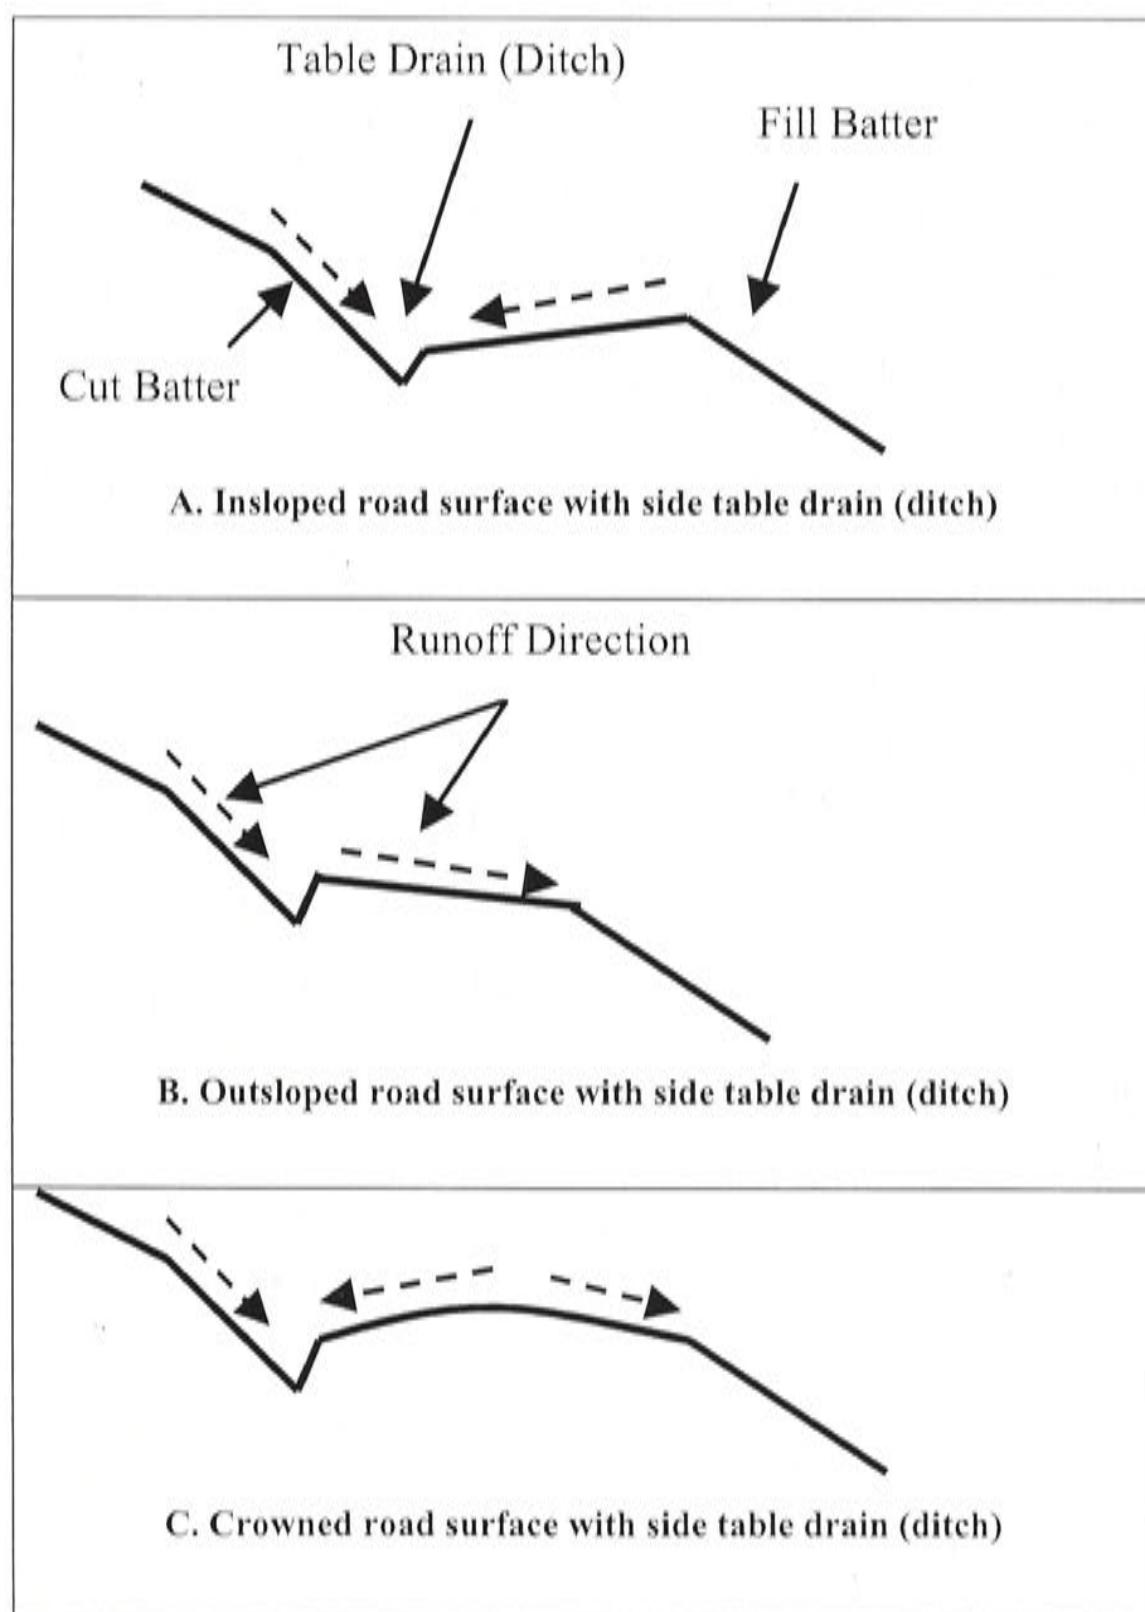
Schematic plan of cross sectional road prism with side table drain structure
